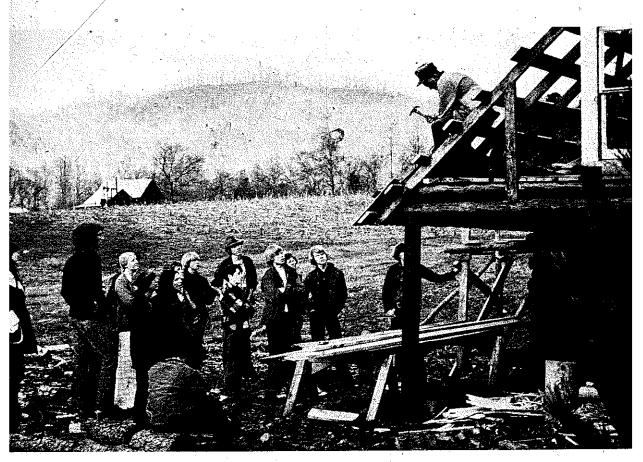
A group of Foxfire editors watch as Woodrow nails on row after row of 24"-long hand-split white oak boards. He is placing them on board fashion (see Plate 315).
